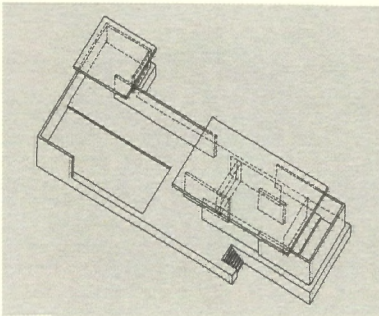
Barcelona Pavilion. (Author's Drawing).
